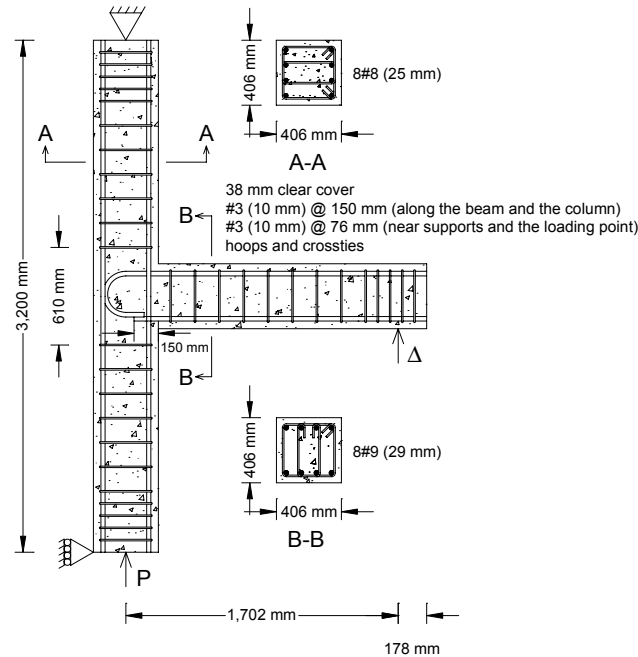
Reinforcing steel layout for the Pantelides *et al.* [2002] Test Units #1 and #2 (1 in. = 25.4 mm).
